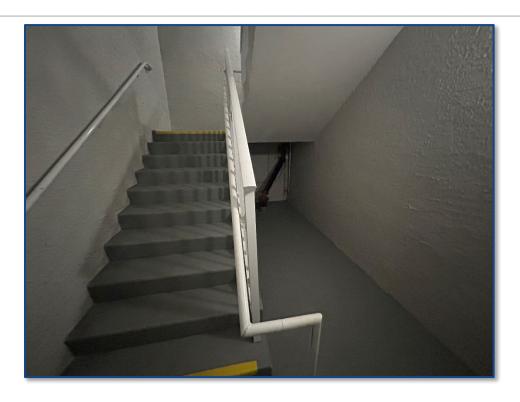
Typical roof access from the stairwell at the east side of the roof.
